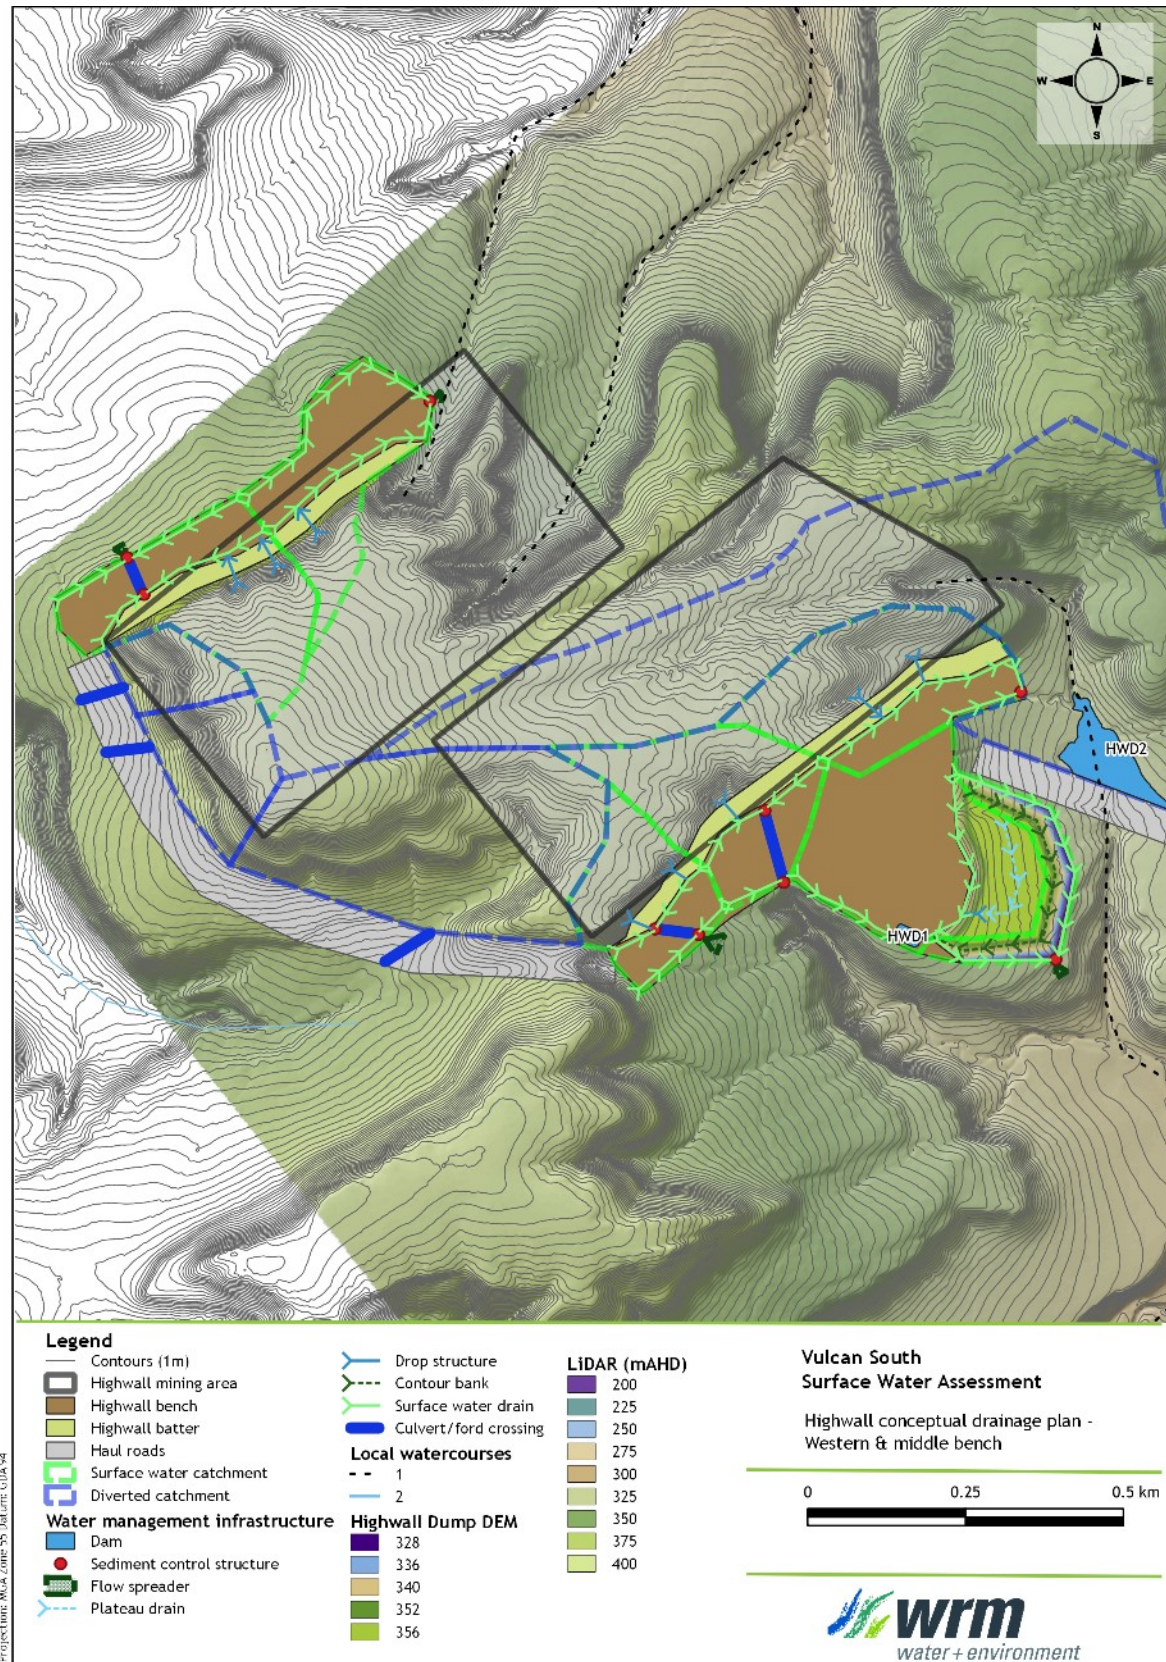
Highwall western and middle bench mining area conceptual drainage plan (Year 2024)
